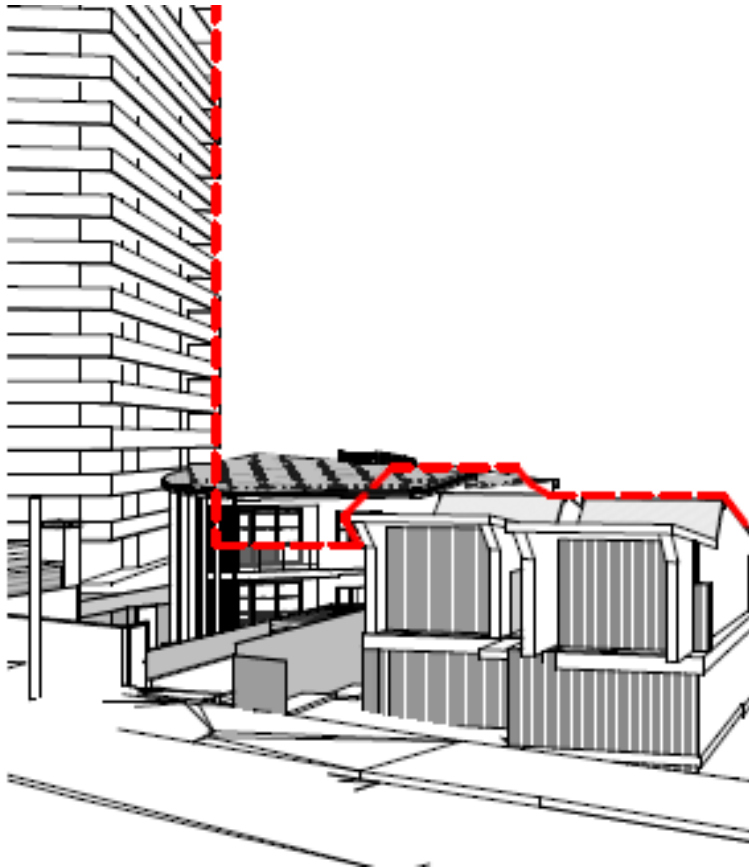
Plan Extract: Level 1 balcony view from 8-10 Lauderdale Avenue.
